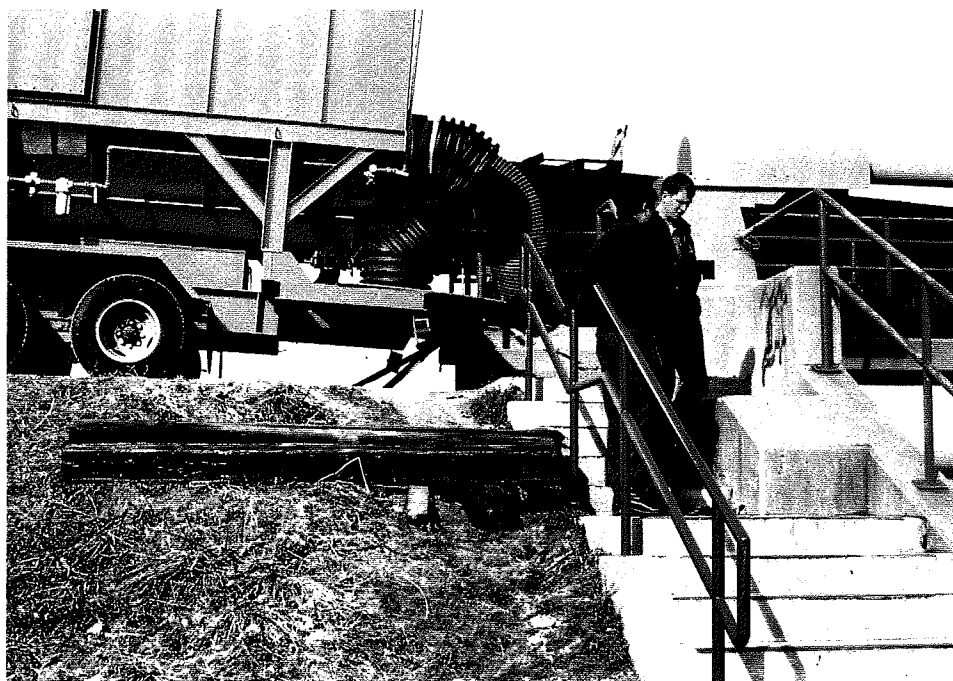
Downstream slope of right embankment. New concrete stairway and painting contractors equipment can be seen. Nov. '92
